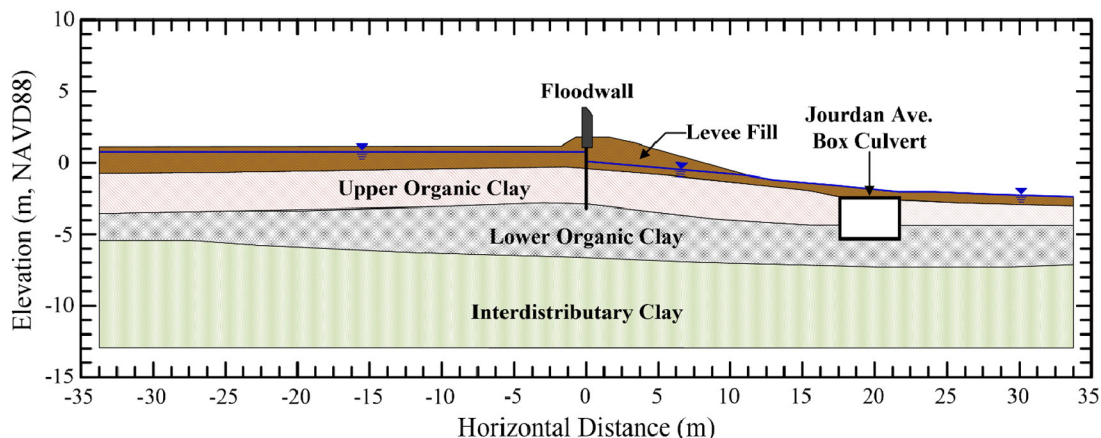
Generalized IHNC I-wall cross-section that shows sheet pile supported floodwall, initial phreatic surface, and a landside backfilled excavation.
